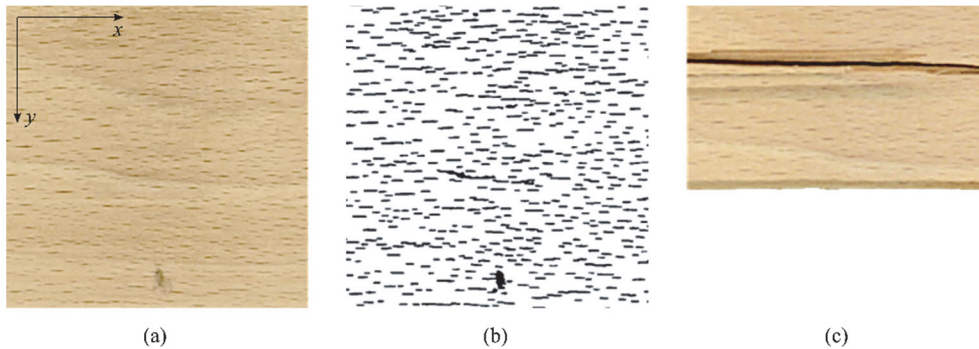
Detail image of a segment of board no. 3002, the spindles formed by the medullary rays running mostly parallel to the longitudinal axis of the board (a), identified objects (b) and fracture path in the same segment (c). This board exhibited a tensile strength of 112 MPa in the tensile test to failure.
